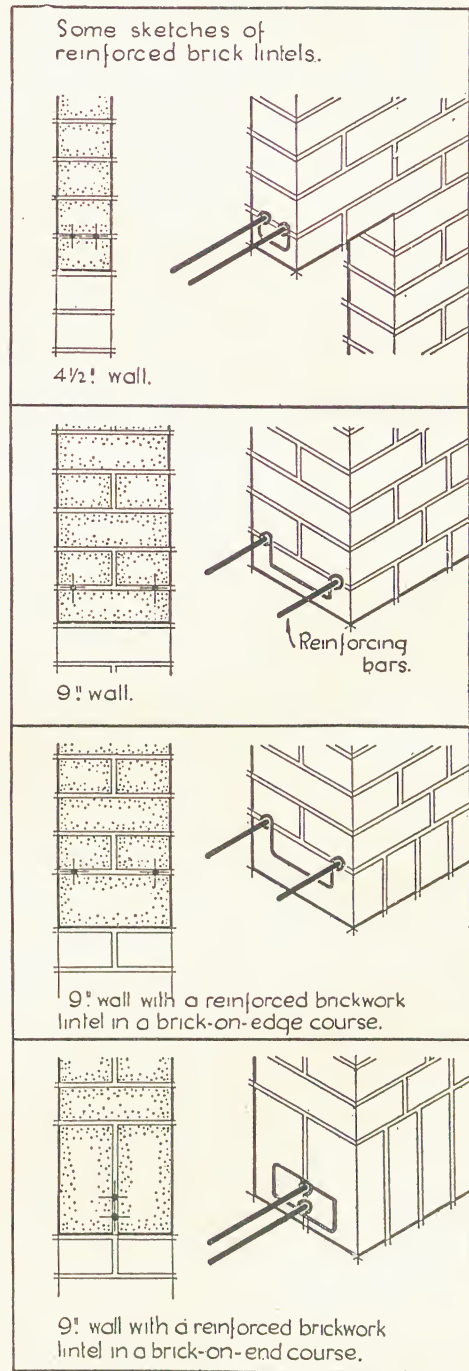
Reinforced brick lintels with mild-steel rods and stirrups in joints.
